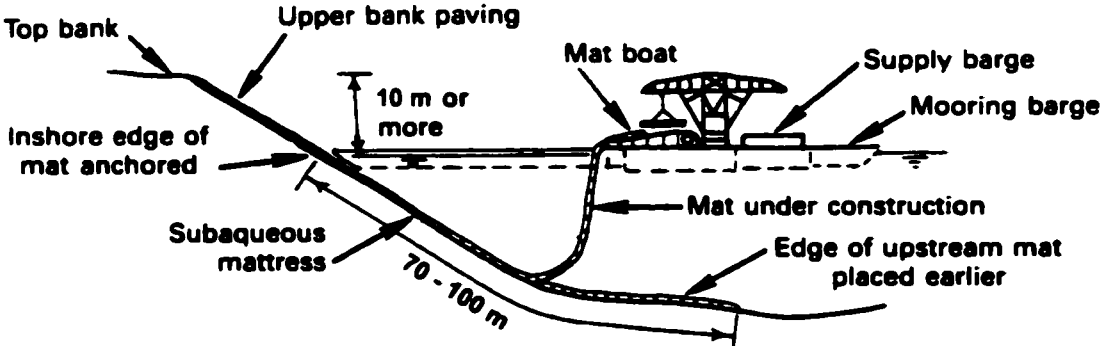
Concrete mattress installation (Petersen, 1986; source: U.S. Army Corps of Engineers, Vicksburg District).
